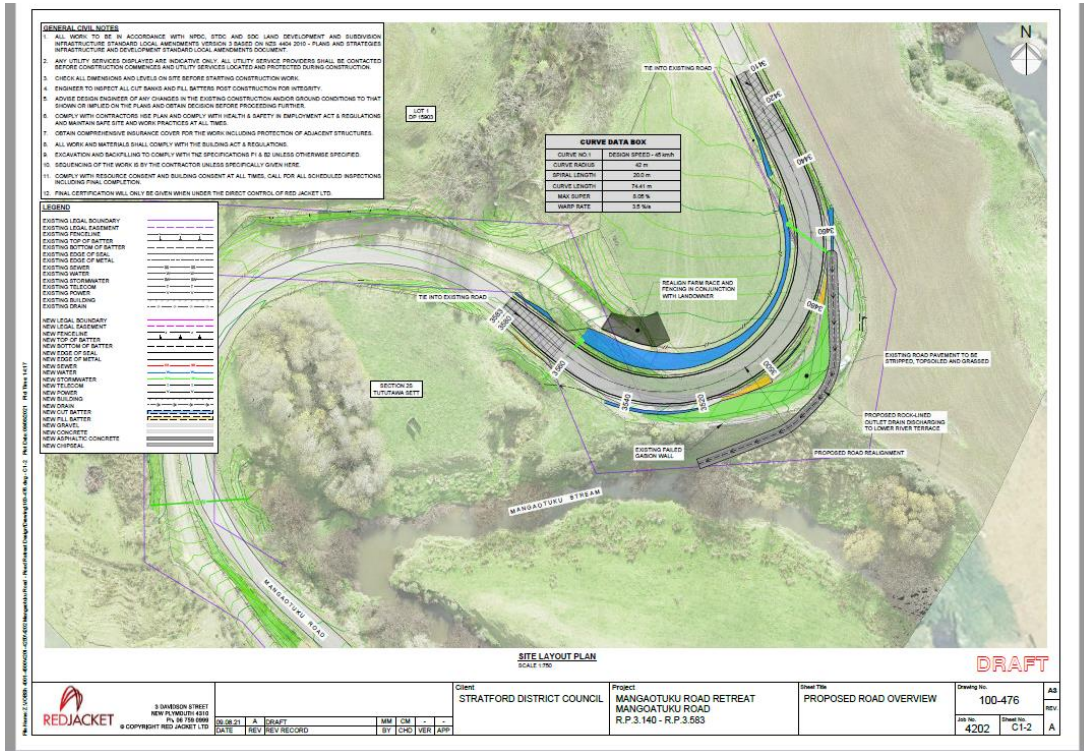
Draft concept plan for Baldock’s Corner on Mangaotuku Rd.
